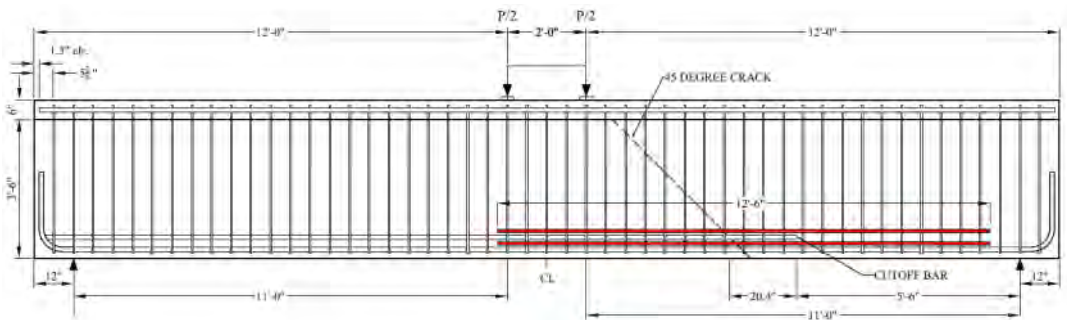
Elevation of specimen T.45.Ld3(6).Ti.
